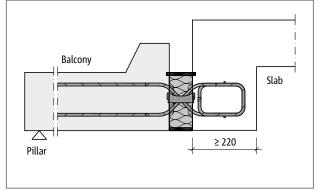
Schöck Isokorb® T type Q-E-W-VV: Installation situation "pre-cast balcony slab"
